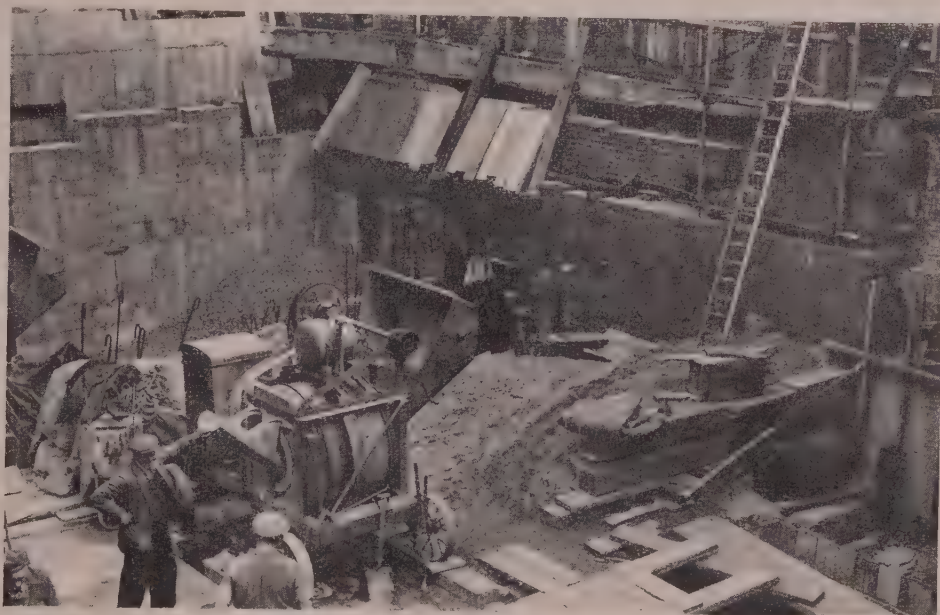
(Photograph by courtesy of DAILY NEWS LTD.)
